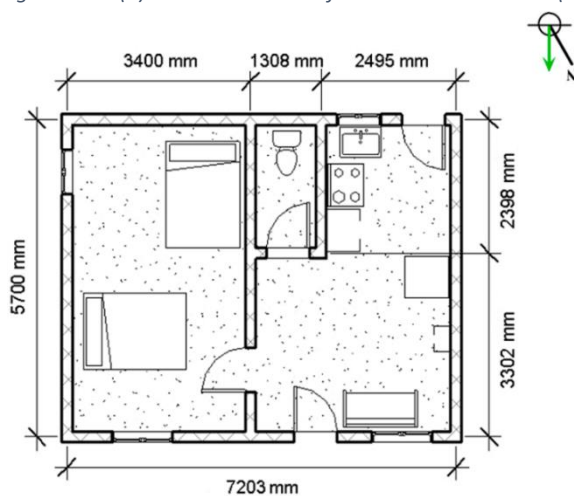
Floor Plan Diagram of the Studied House (Kelvin et al., 2017)
